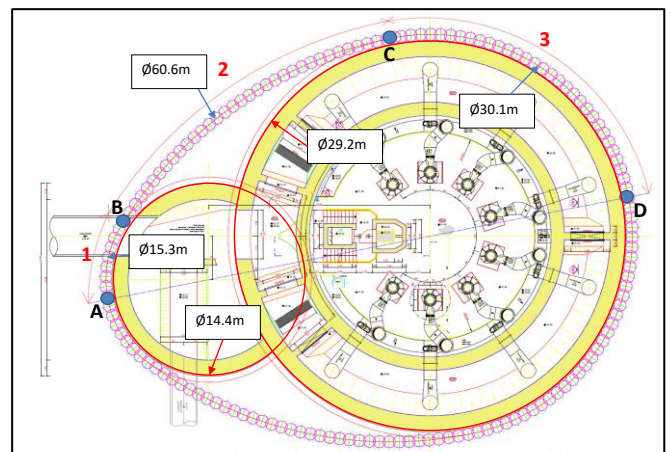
Layout drawing of the secant pile wall and Inlet Pumping Station
